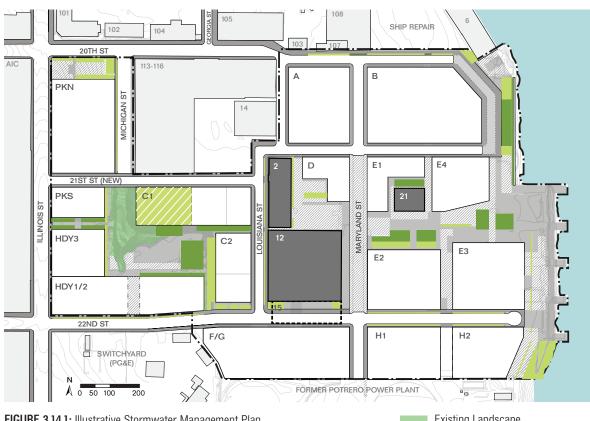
Illustrative Stormwater Management Plan
